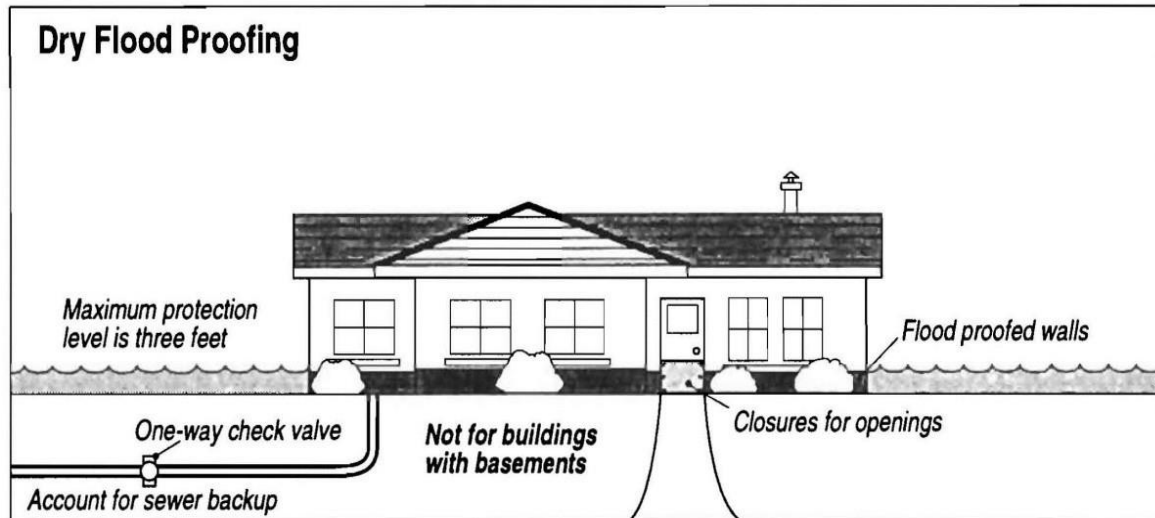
Dry Flood Proofing (Diagrammatic Detail).
